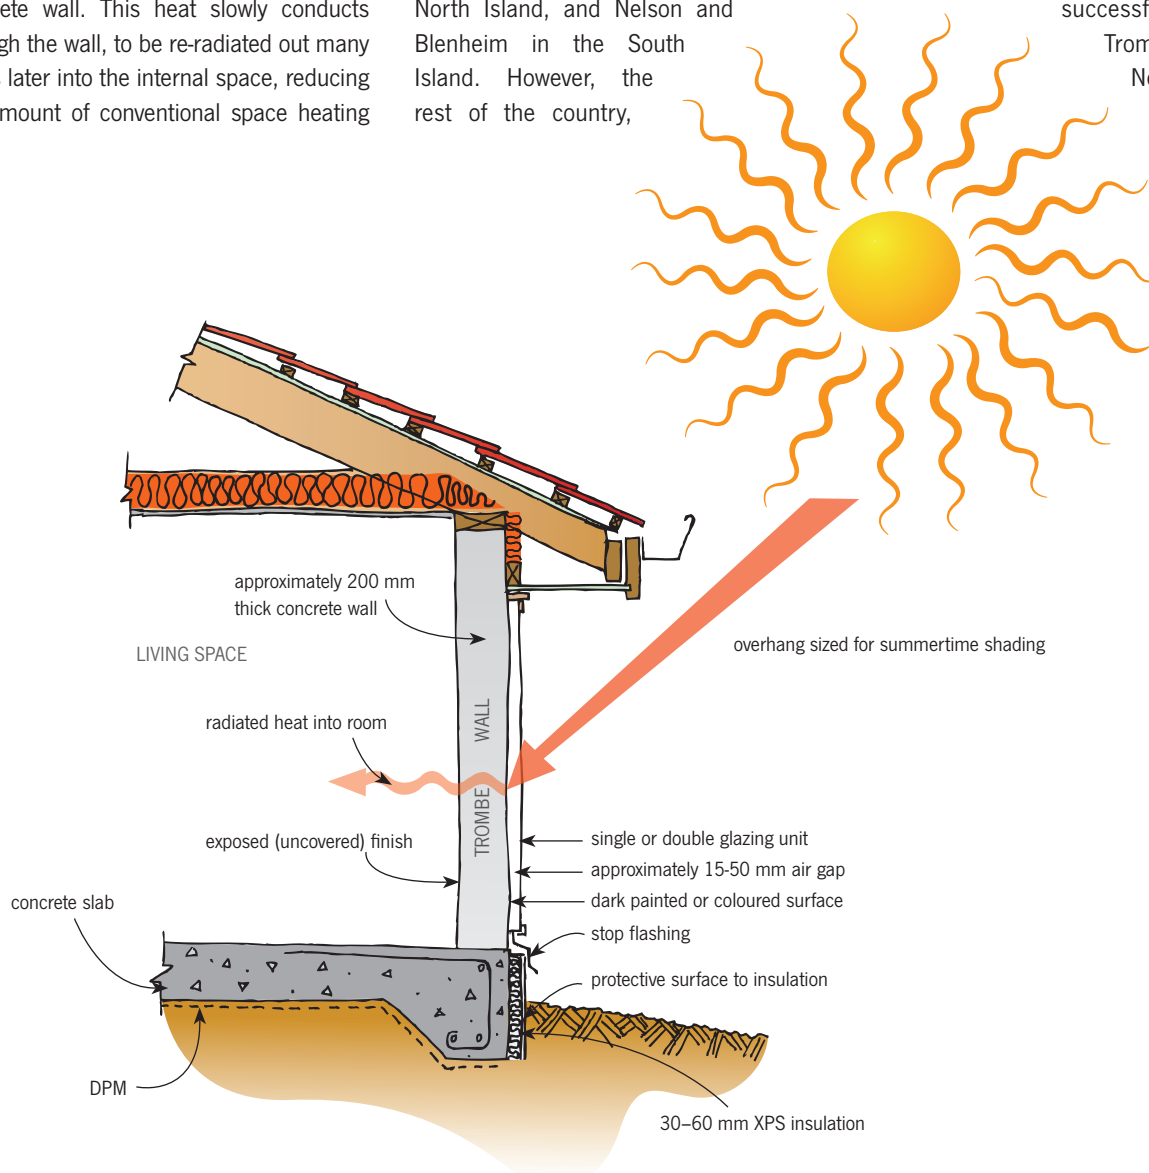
Schematic cross-section of typical Trombe wall, showing key components.
